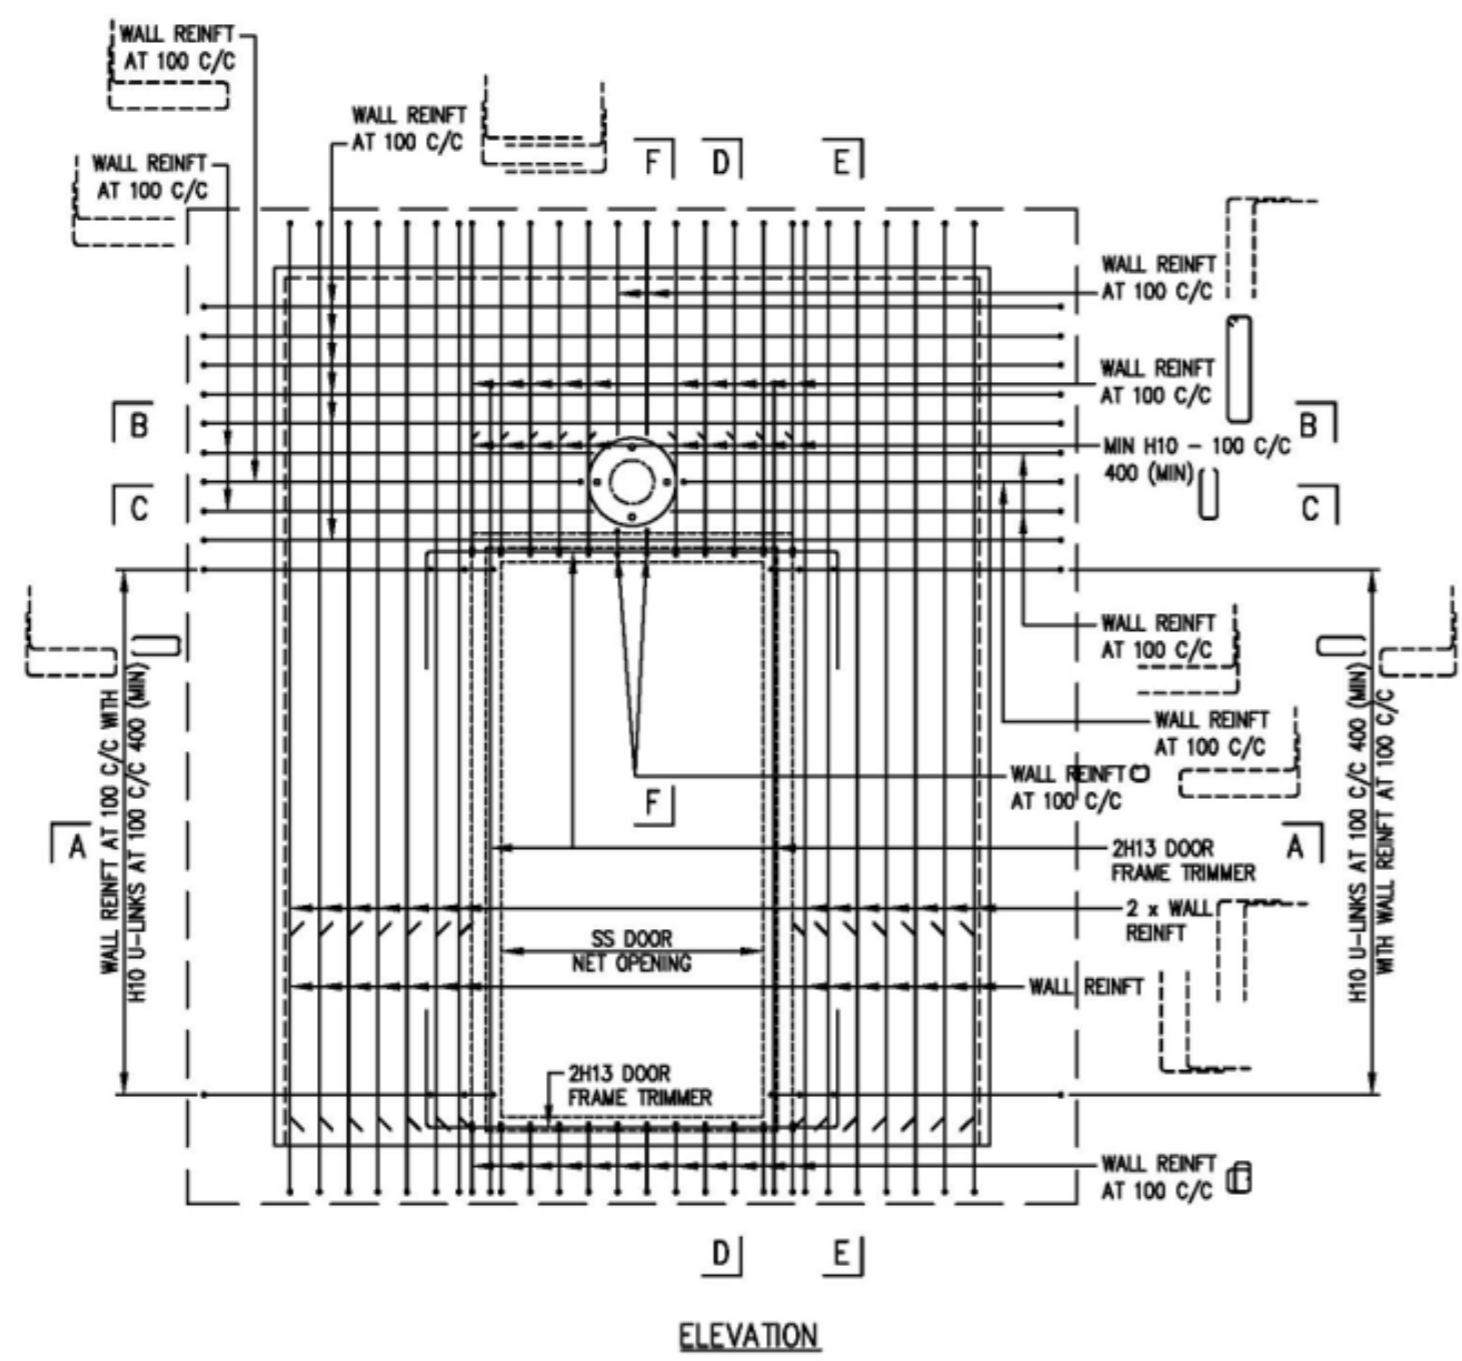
(k): PLAN OF SS WALLS WITH PRECAST SS DOOR FRAME PANEL (TYPE 3)
